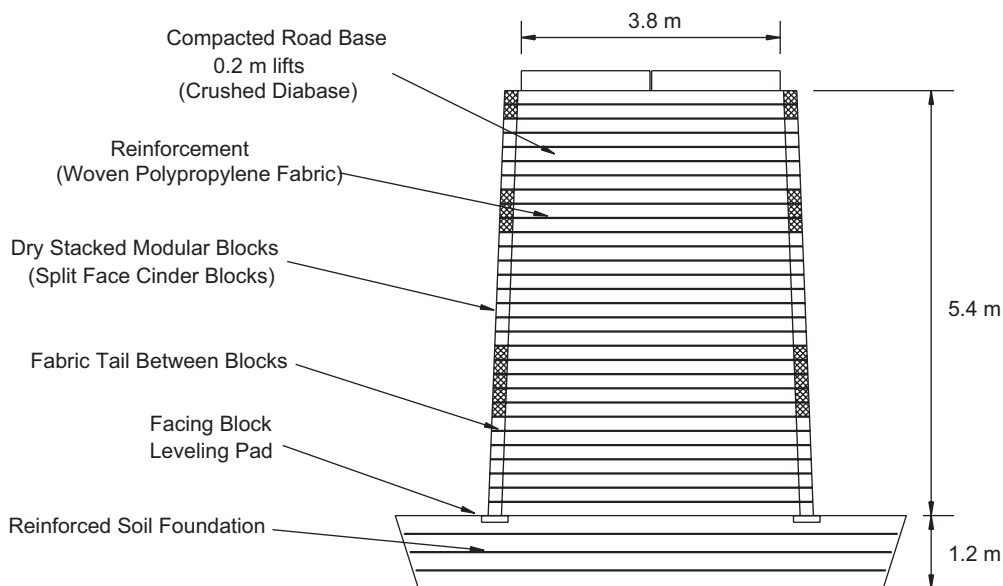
Cross-section of the FHWA Turner-Fairbank GRS bridge pier (Adams, 1997).
